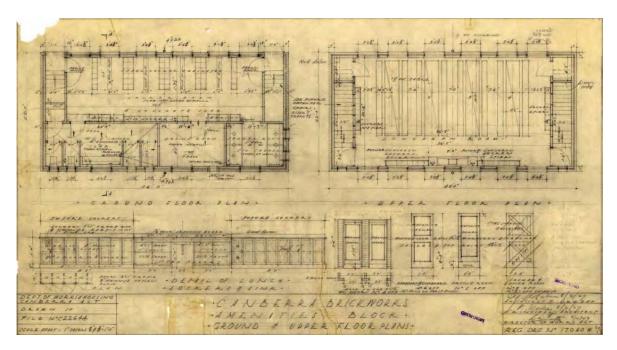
Amenities Block floor plans, 1947. (Source: National Archives of Australia.)
